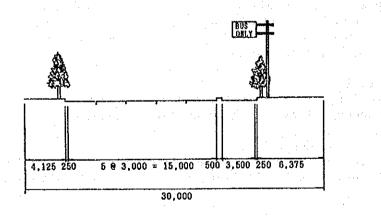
Proposed Typical Cross Section of 6a and 7a Ave.
